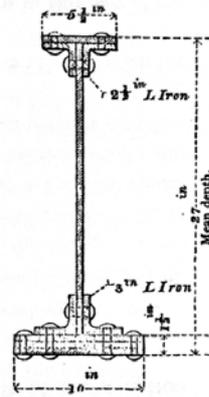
Ware Bridge wrought-iron girder section with proportions appropriate to cast iron, 1841. Robert Stephenson. (Fairbairn¹)
